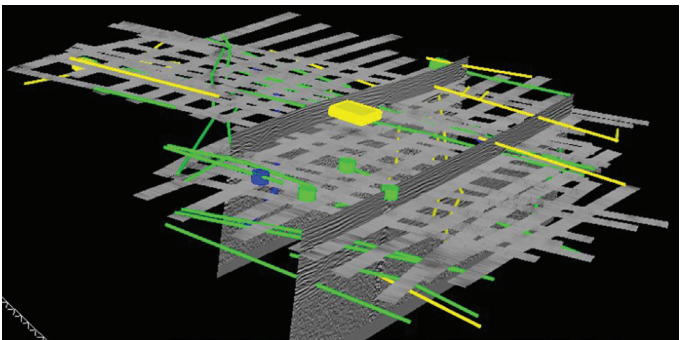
A C-scan 3D view of an intersection of Vesivärava Street and Faehlmanni Street
